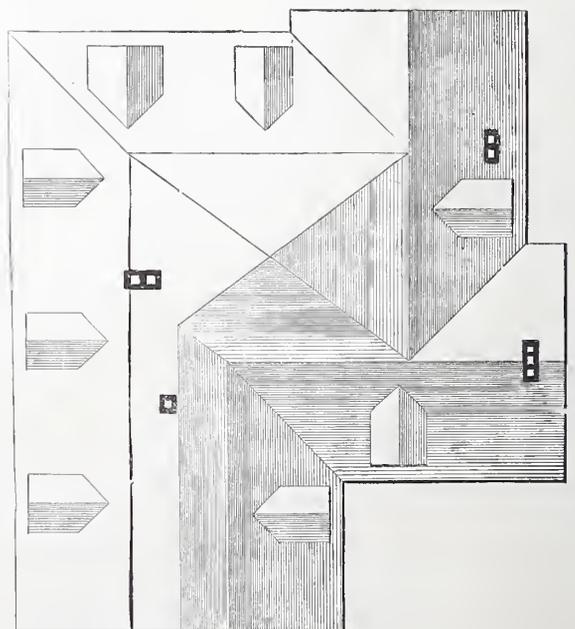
Roof Plan.—Scale, 1-16 Inch to the Foot.
